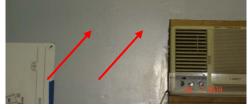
Asbestos-containing joint compound associated with drywall ceilings and a wall are located in various rooms of the structure.
